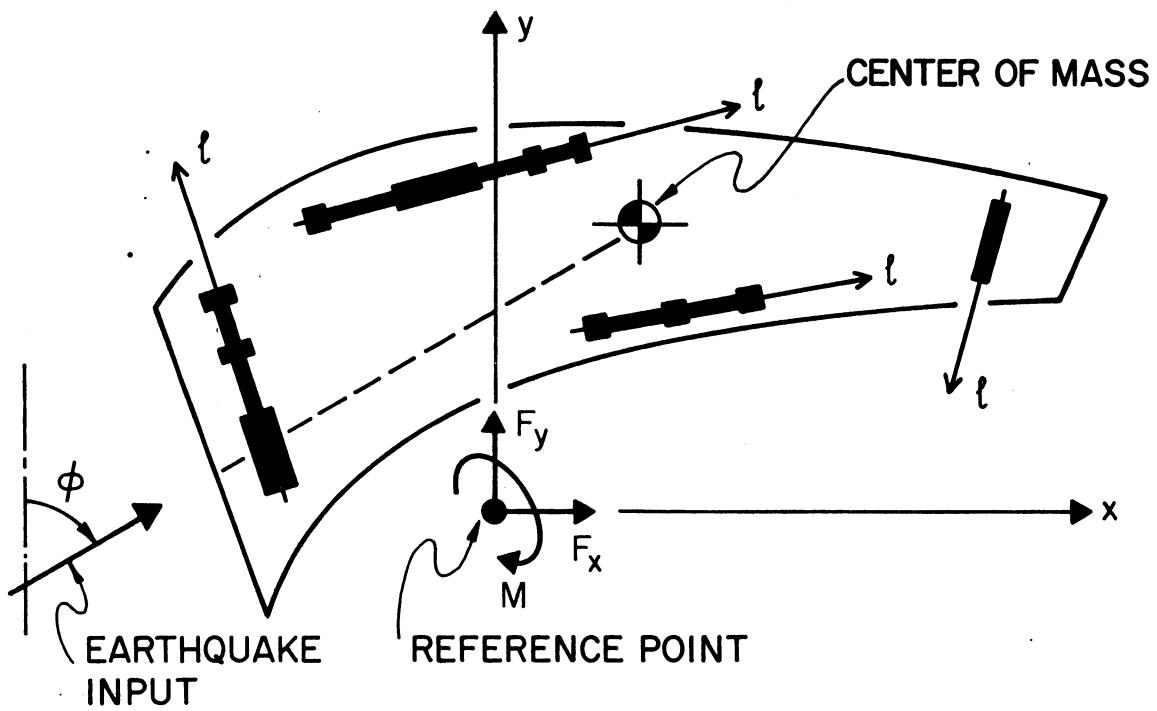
PLAN VIEW (TYPICAL BUILDING)
